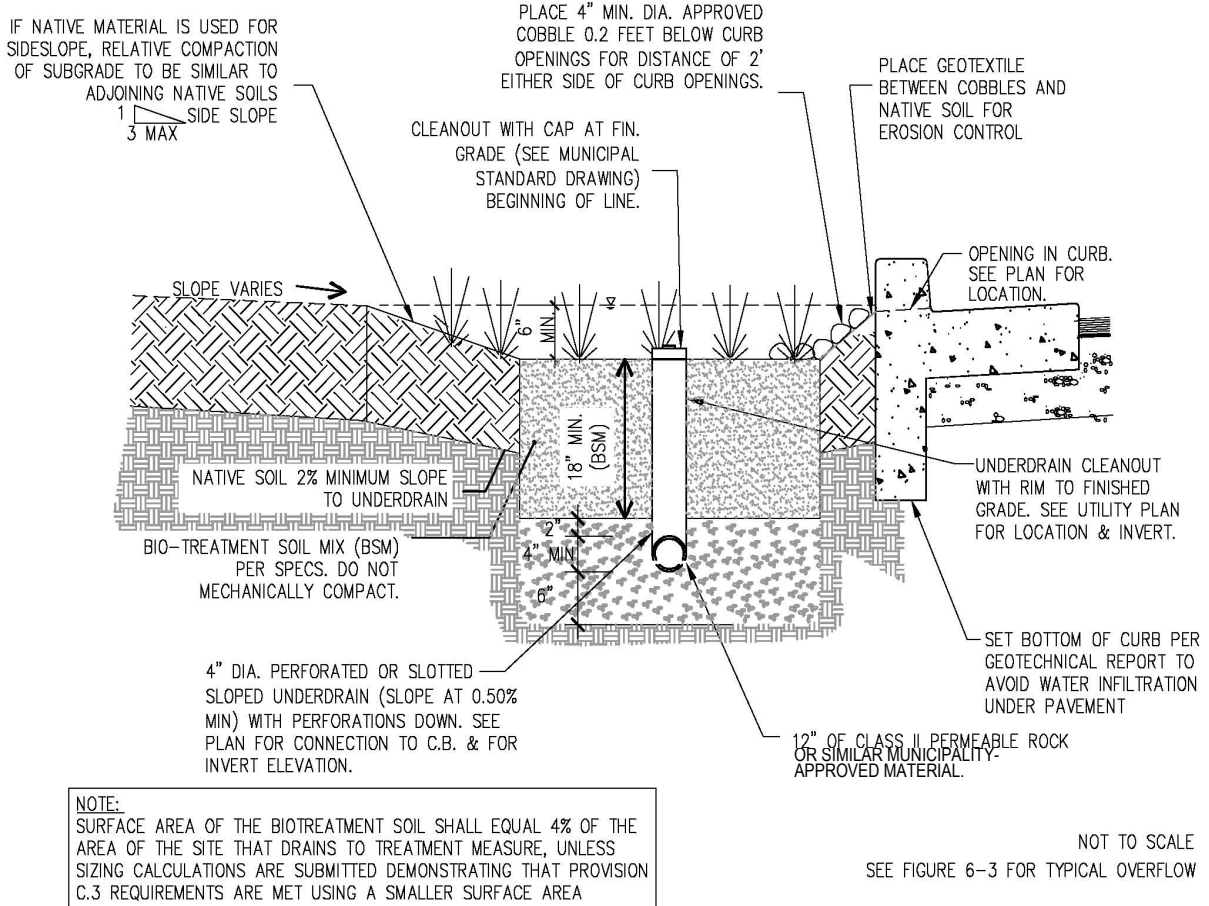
Cross section of bioretention area showing inlet from pavement.
